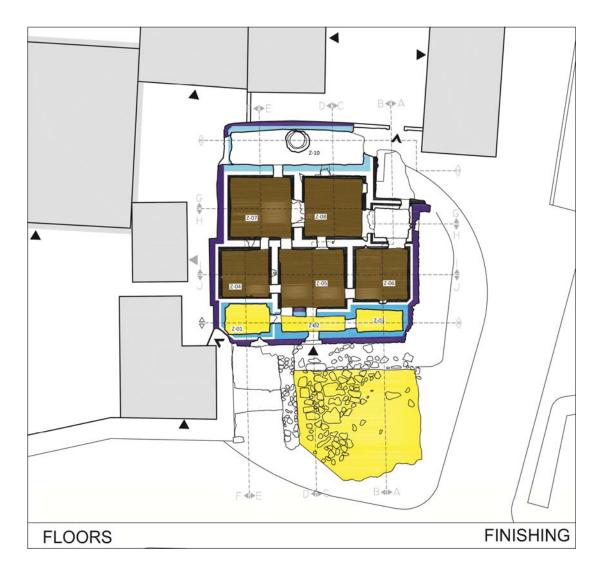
, Construction Technique and Material; Floor Covering and Finishing
